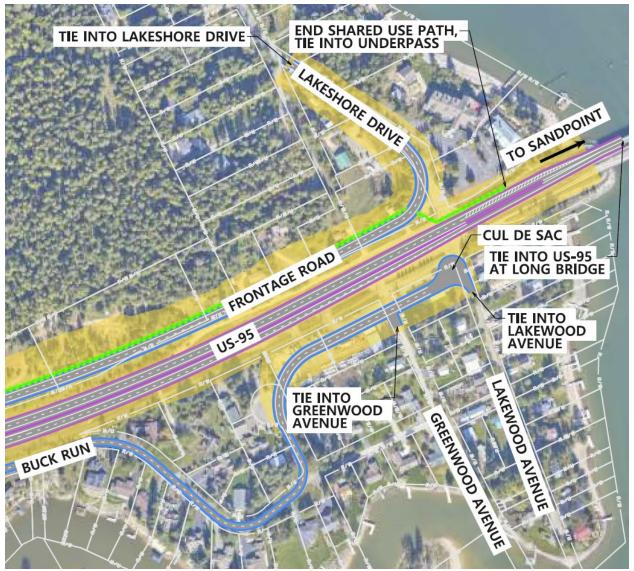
US-95 Proposed Action - Access Controlled Highway and Frontage Roads
